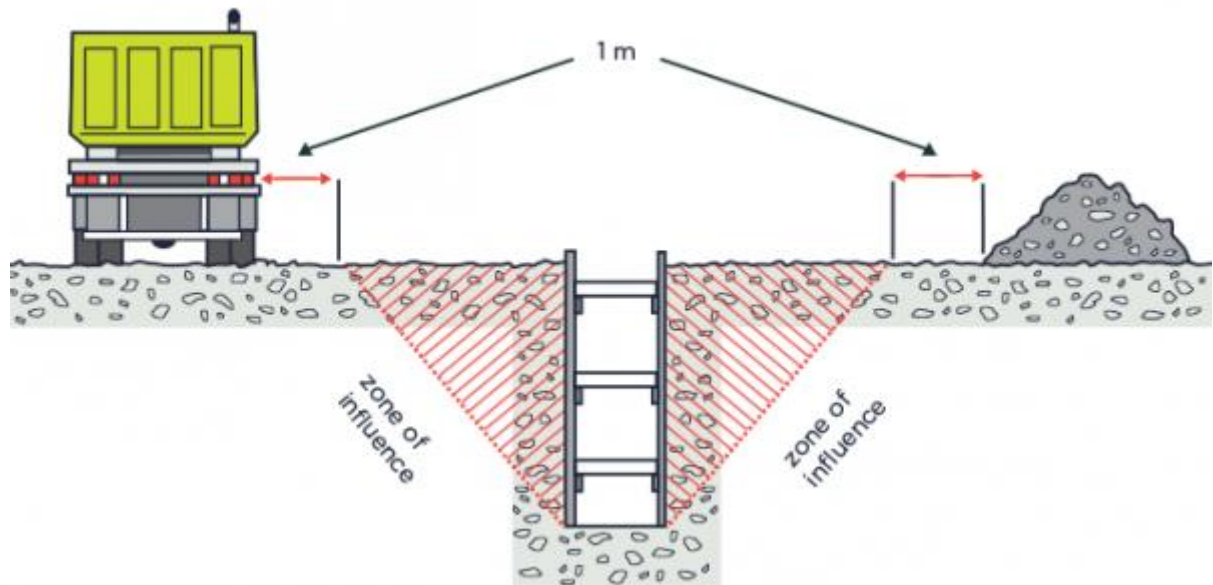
Examples impact of loading or surcharge on ground in proximity to open excavations.¹⁴
